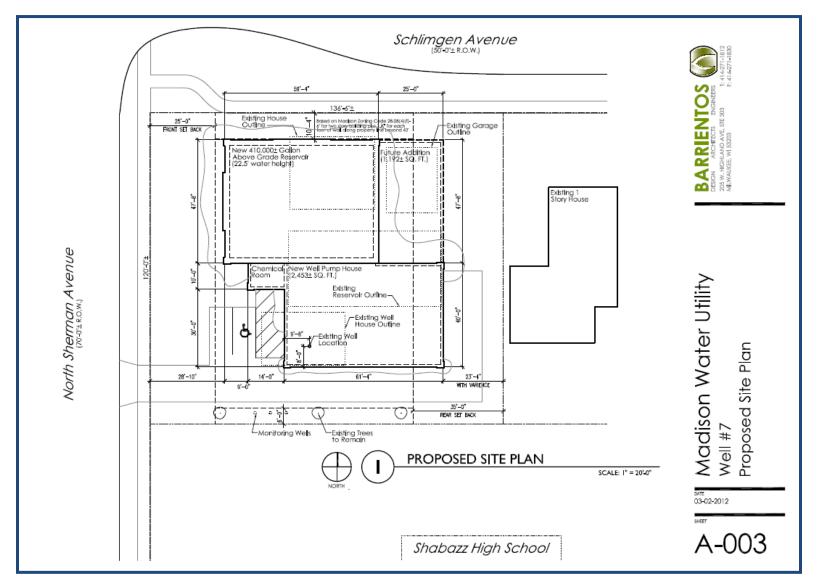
Proposed Site Plan Unit Well 7 with Expanded Site
